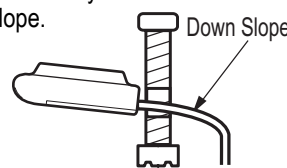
Convertible Surface (Wall Mounted Installation) Indoor Unit with Gravity Drain and Down Slope.
